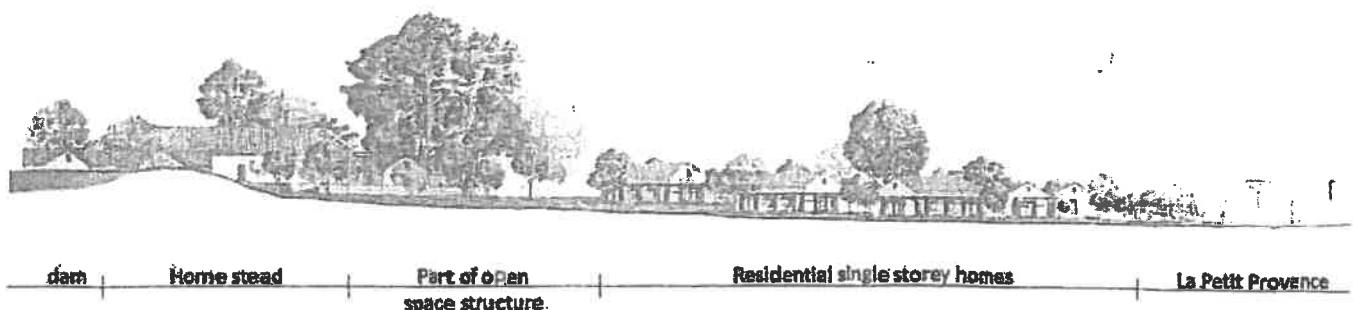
Indicative sectional elevation of new development alongside the new "werf" and homestead [Urban Concepts]
